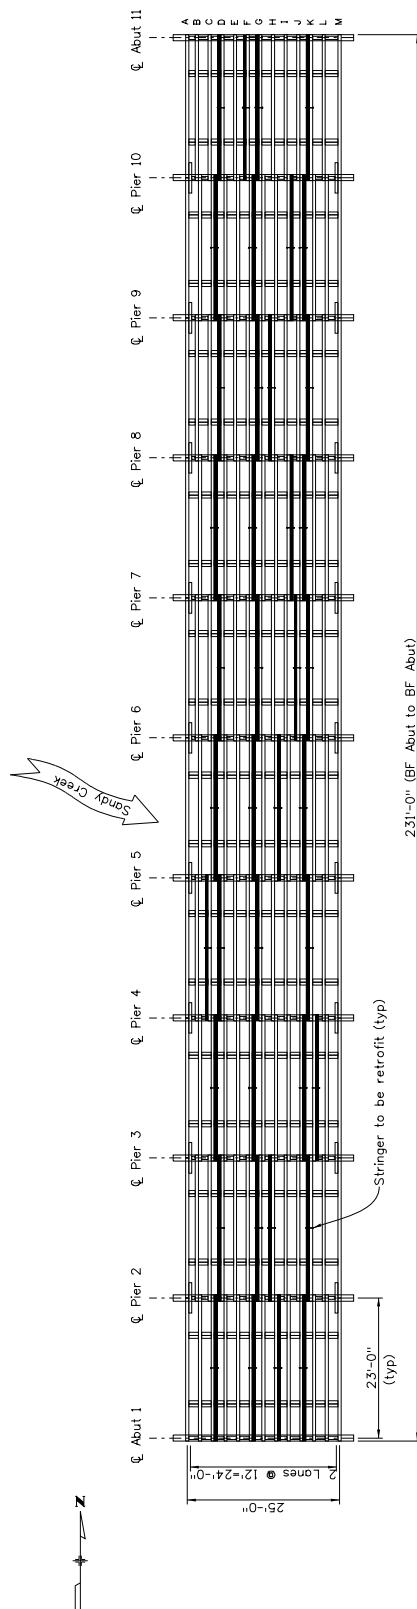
(H)-2 Example of General Layout for a timber stringer repair project
